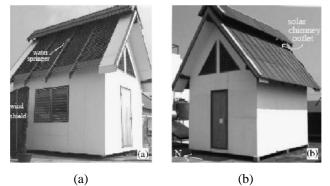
(a) Roof pond facing north direction, (b) Solar chimney facing south direction³
